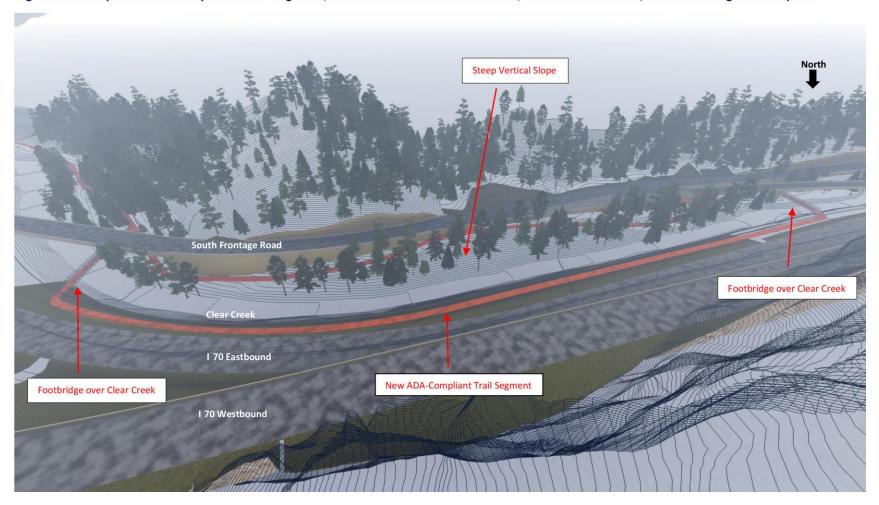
Proposed ADA-Compliant Trail Segment, Scott Lancaster Memorial Trail, Tunnel Alternative, South Frontage Road Option
